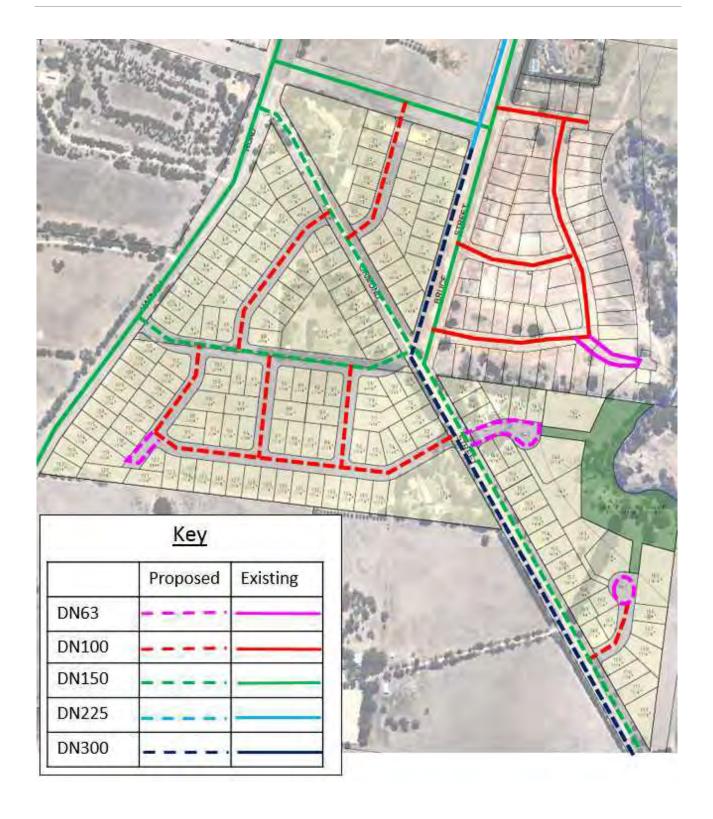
5, 20, 25 and 30 Ormond Street Bannockburn-Water mains layout. (Source: Barwon Water)
